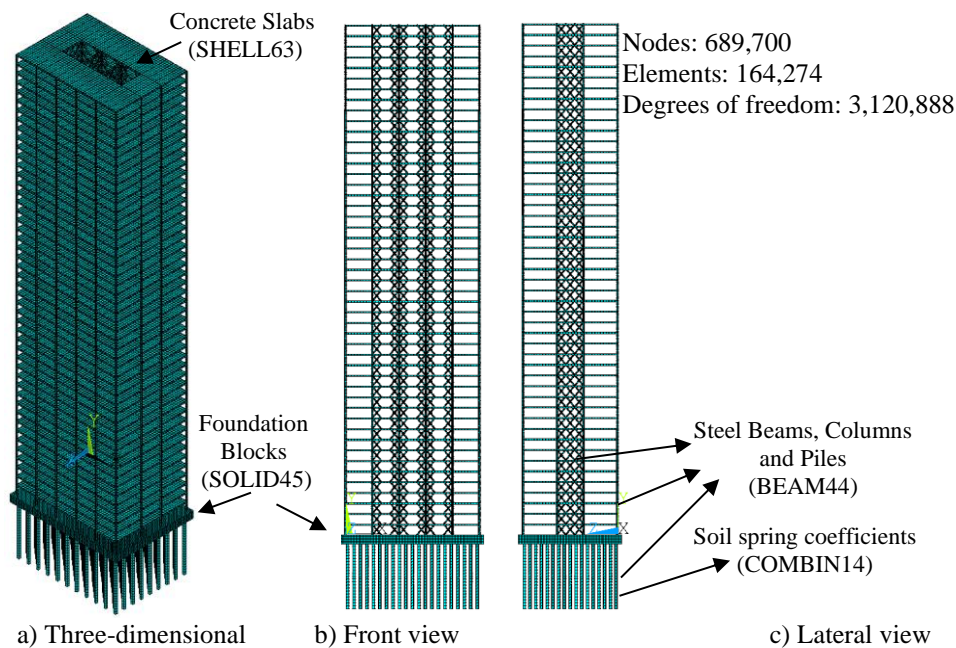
Steel-concrete composite building finite element model:  $H = 172.8$  m.
